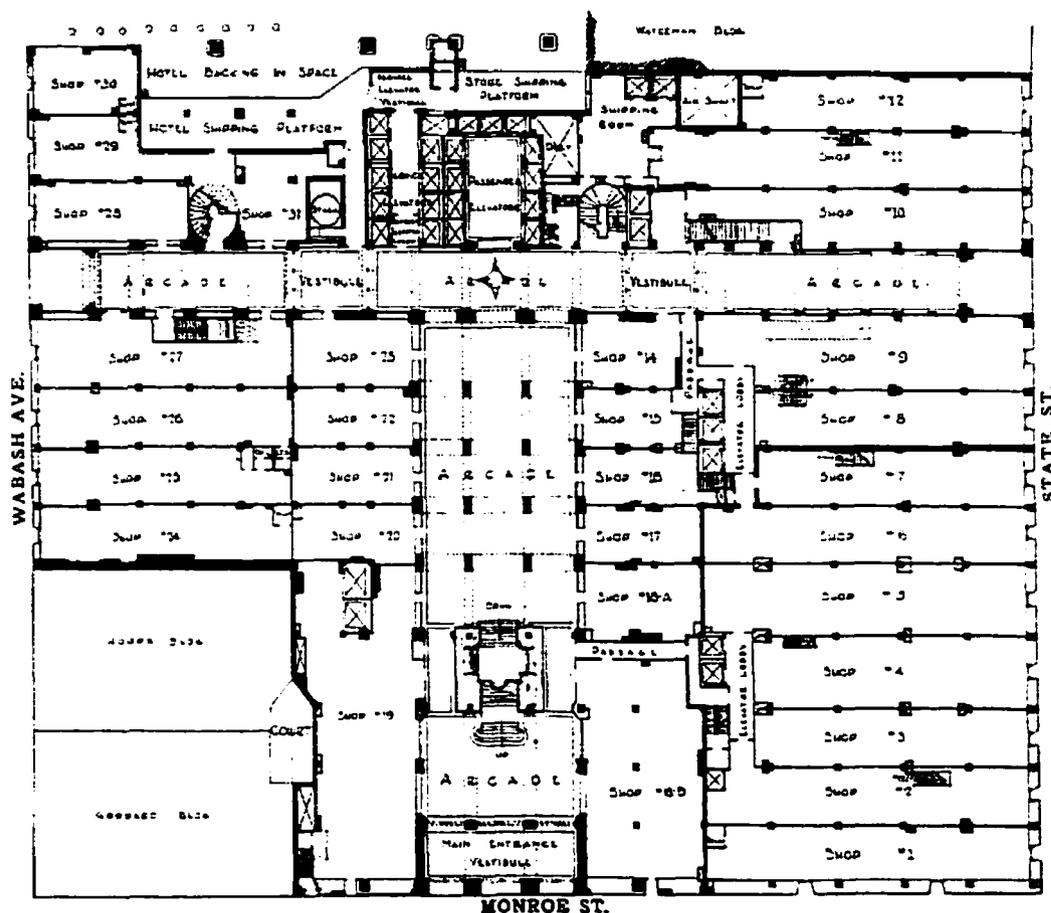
Holabird and Root, Palmer House, ground floor plan, 1925.
